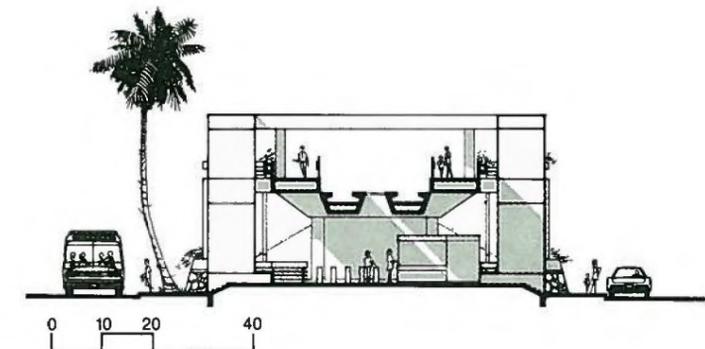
Typical Aerial Station (Side Platform) Plans and Sections
